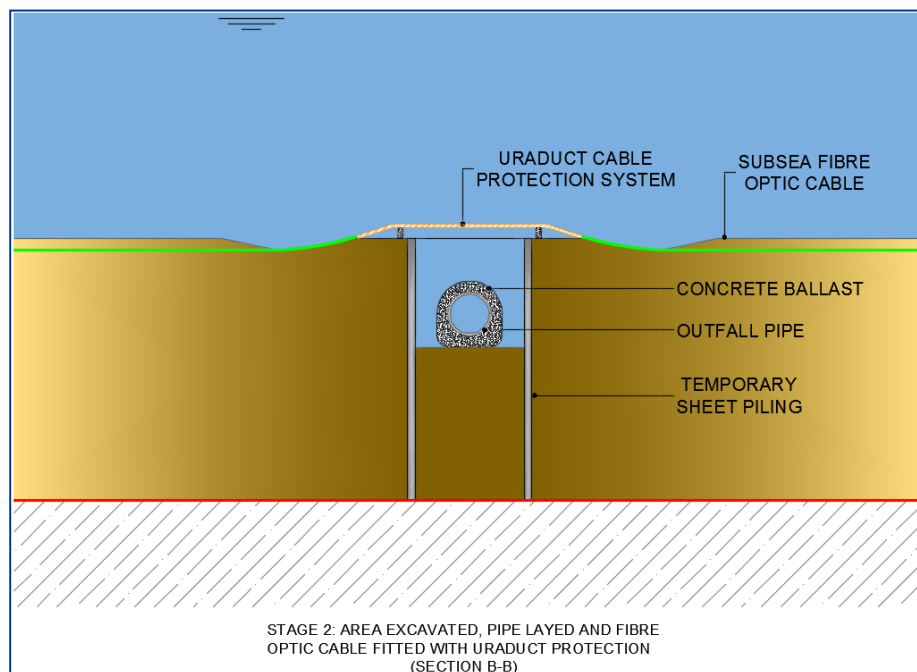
Fibre Optic Cable Crossing – Stage 2– Install Outfall Section
